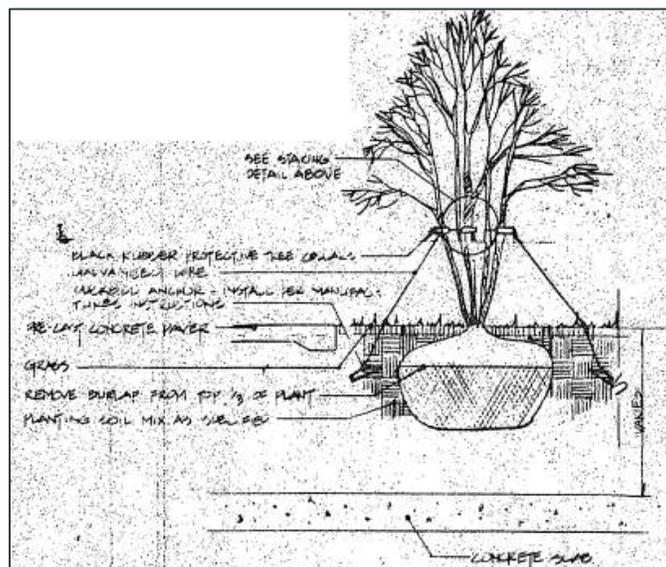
Original section detail of crepe myrtle installed within concrete planter cell
